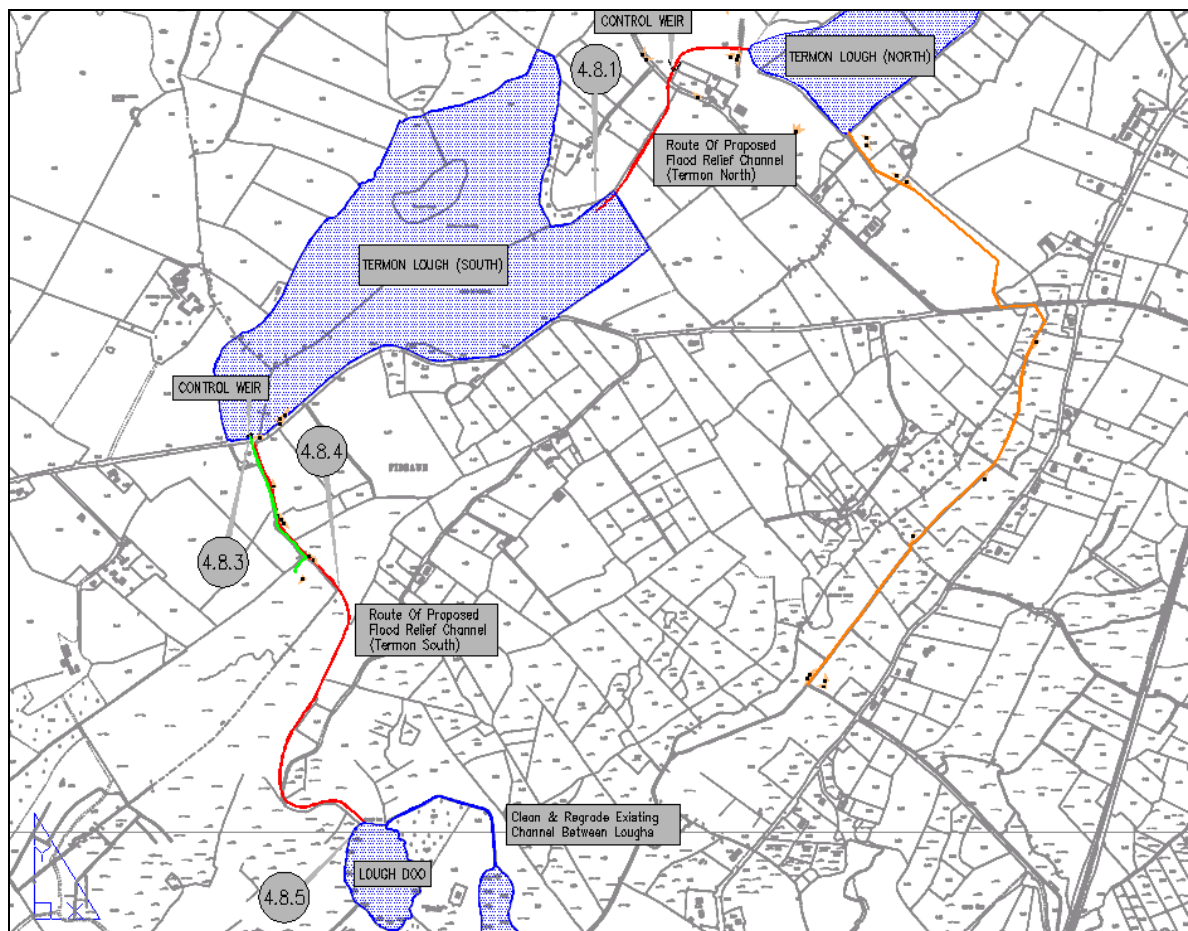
Original possible drainage Scheme shown red (newly built piped and open channel system shown green)
